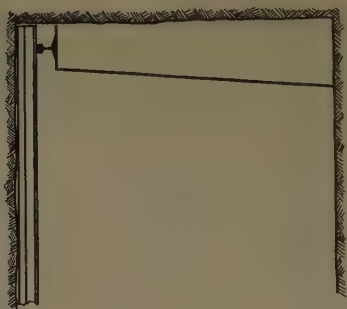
TYPICAL CONSTRUCTION OF MAIN INTAKES.
